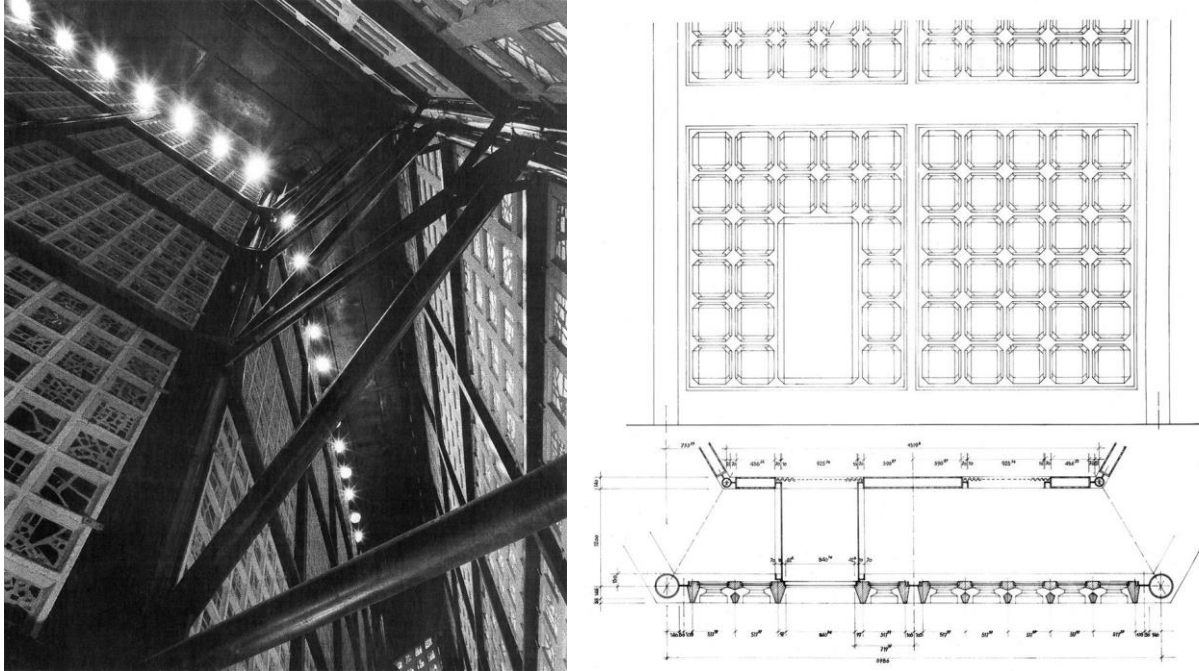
& 13 Egon Eiermann, double wall system, Kaiser Wilhelm Memorial Church, Berlin, Germany, 1959-63. Photo and drawing from Artstor.
